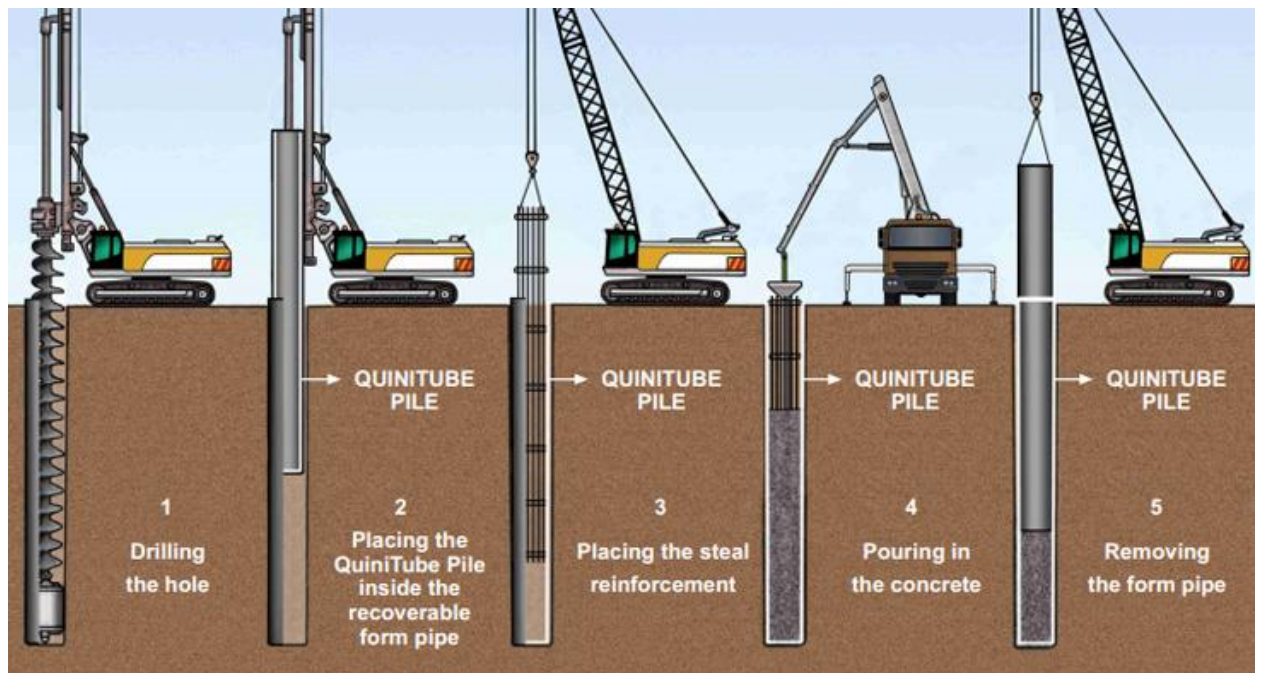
Manufacturing technology of the pile foundation at the construction site.
